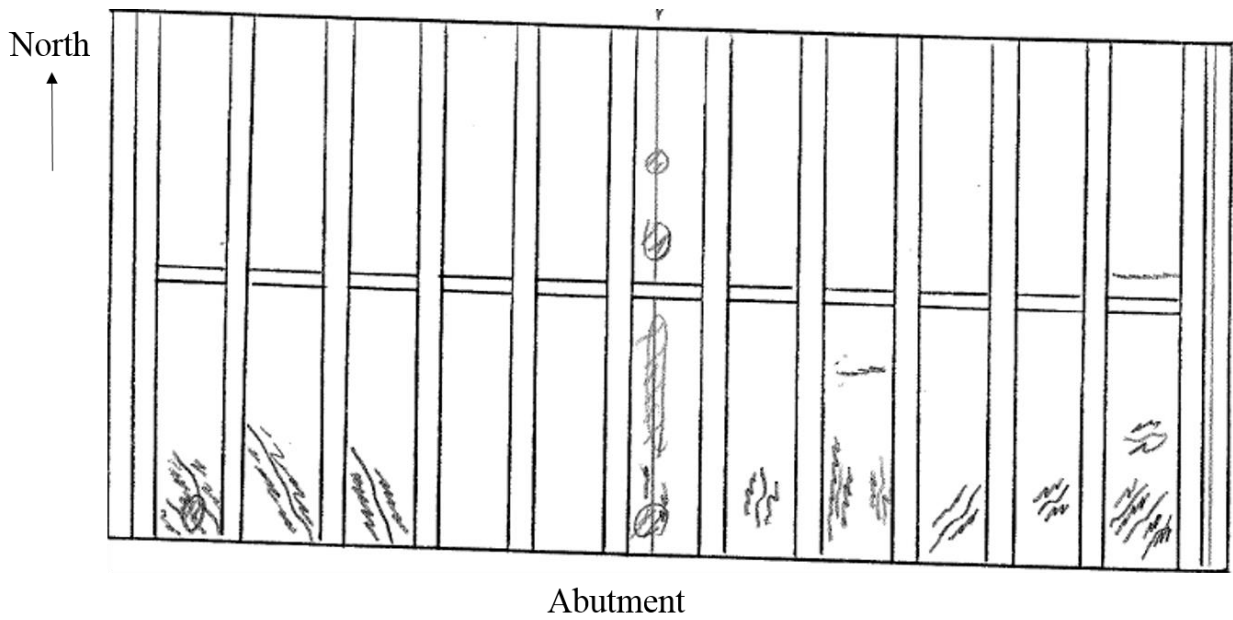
Crack map at bottom of deck on south side of Bridge #605220
